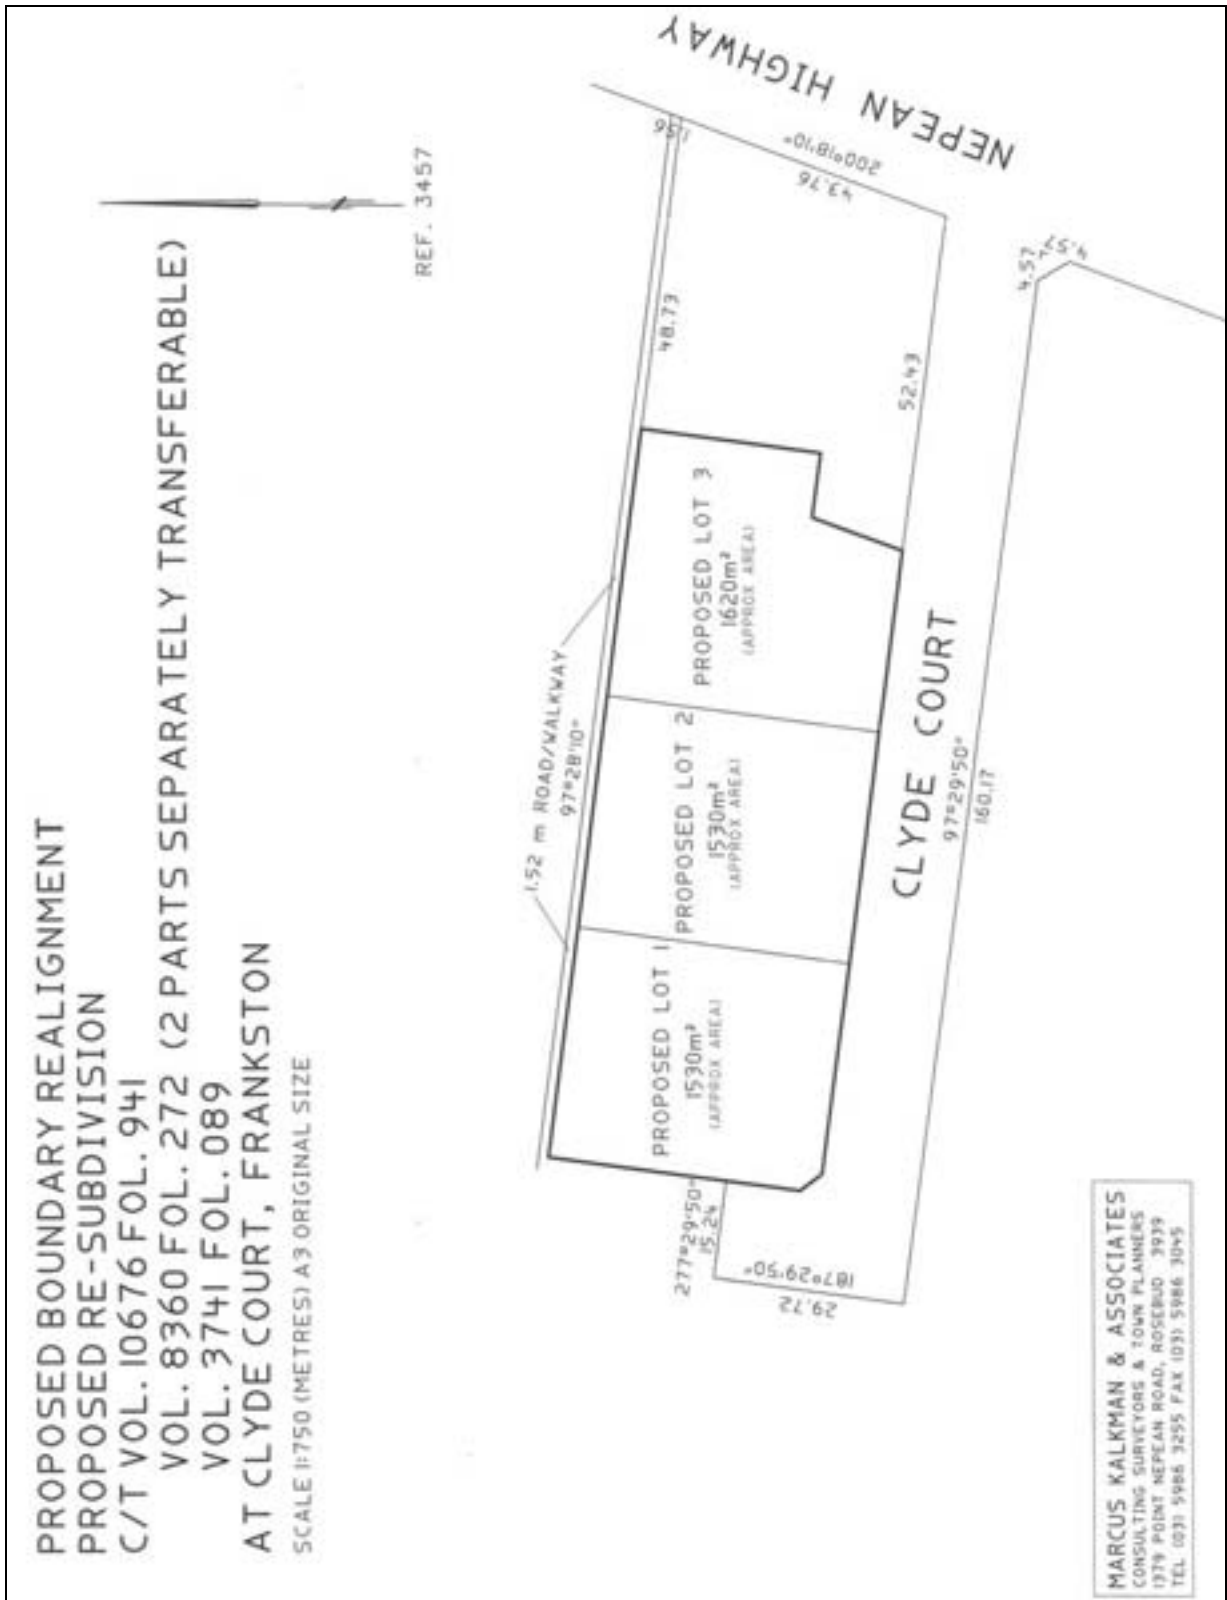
Olivers Hill Lot Restructuring Plan Sheet 2
